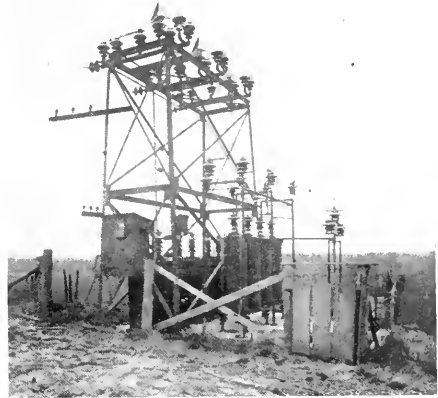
TYPICAL 44 000 VOLT SUBSTATION
